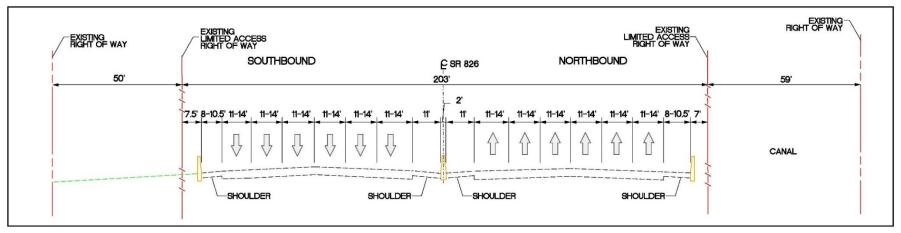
2: No-Build Roadway Typical Section between SR 874 and SR 836
